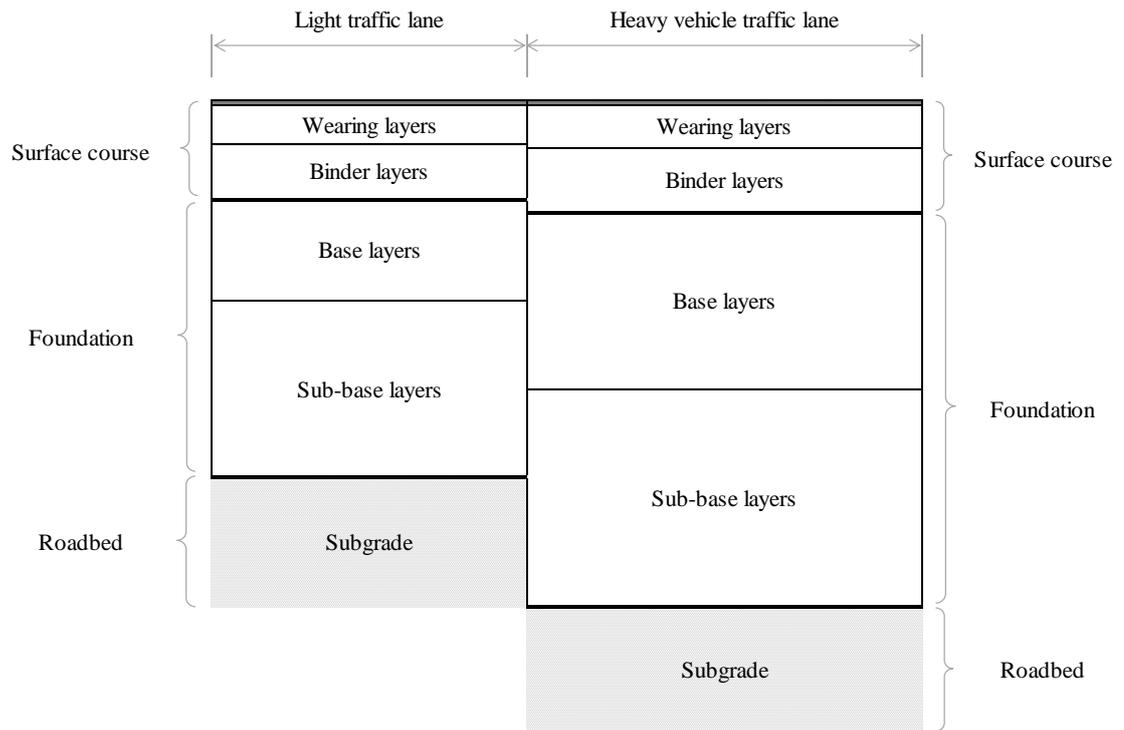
Pavement structures for light traffic lane and adjacent heavy vehicle traffic lane
